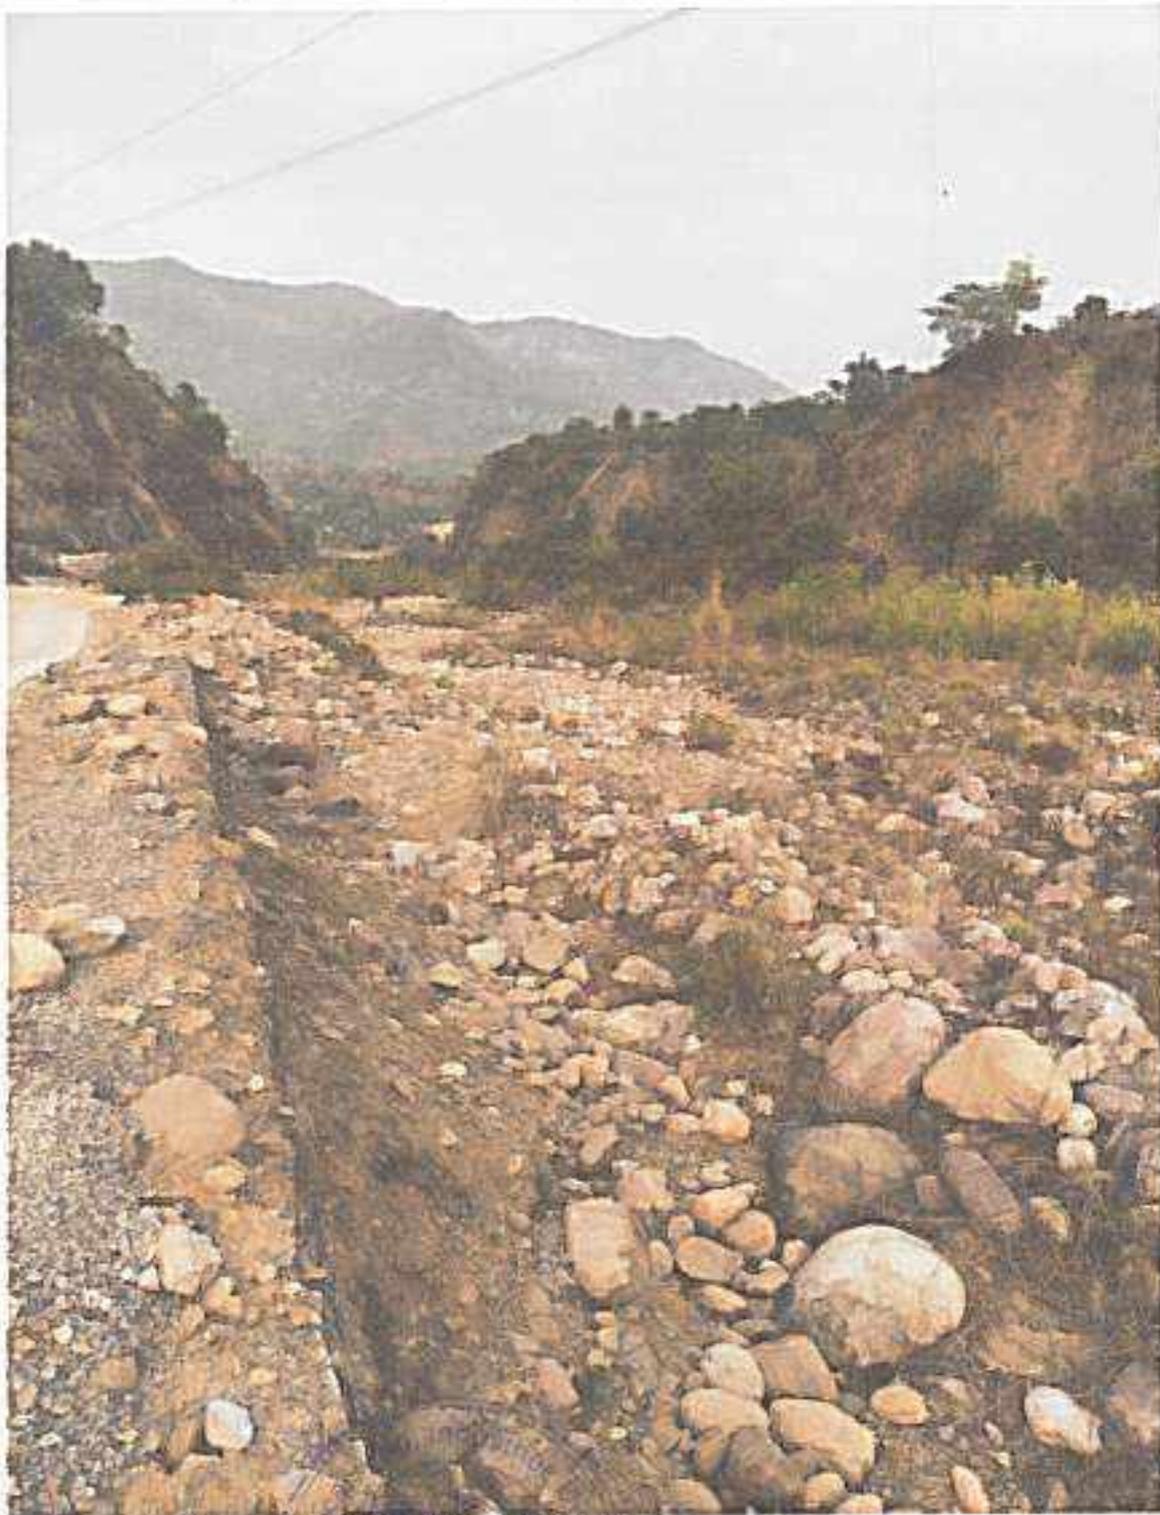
Nature of Banks showing wire crate protection wall along the rural road.
